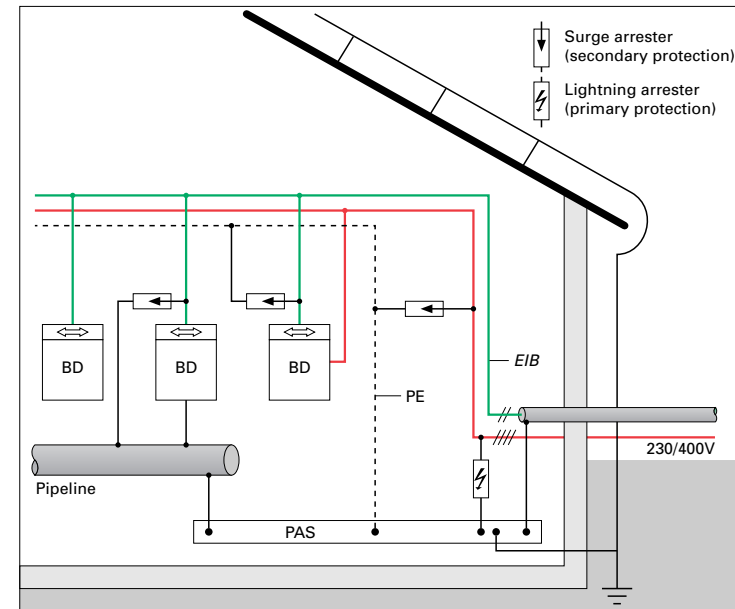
Connection of surge arresters with cables laid in metal channels or pipes between buildings
